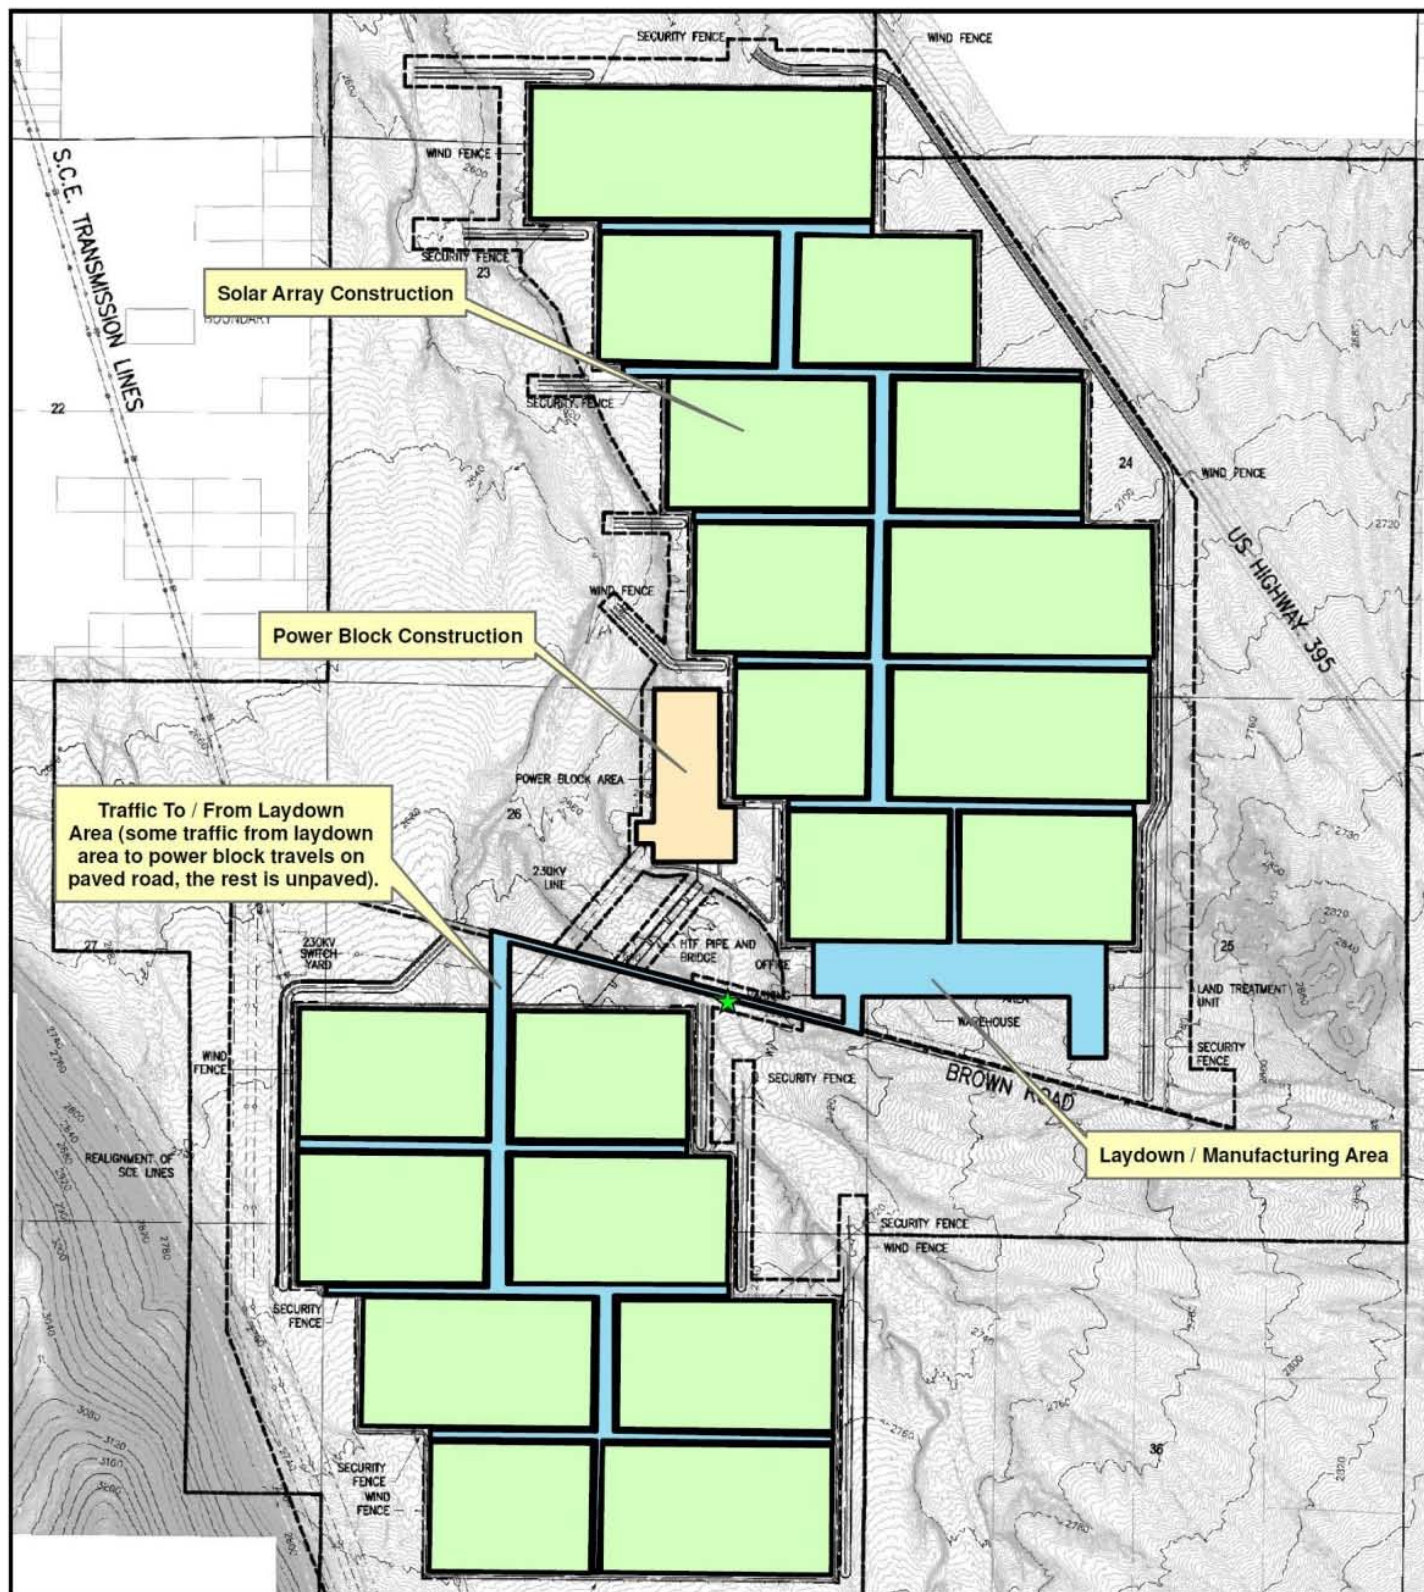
Revised Area Sources Used in Short Term Construction Modeling
